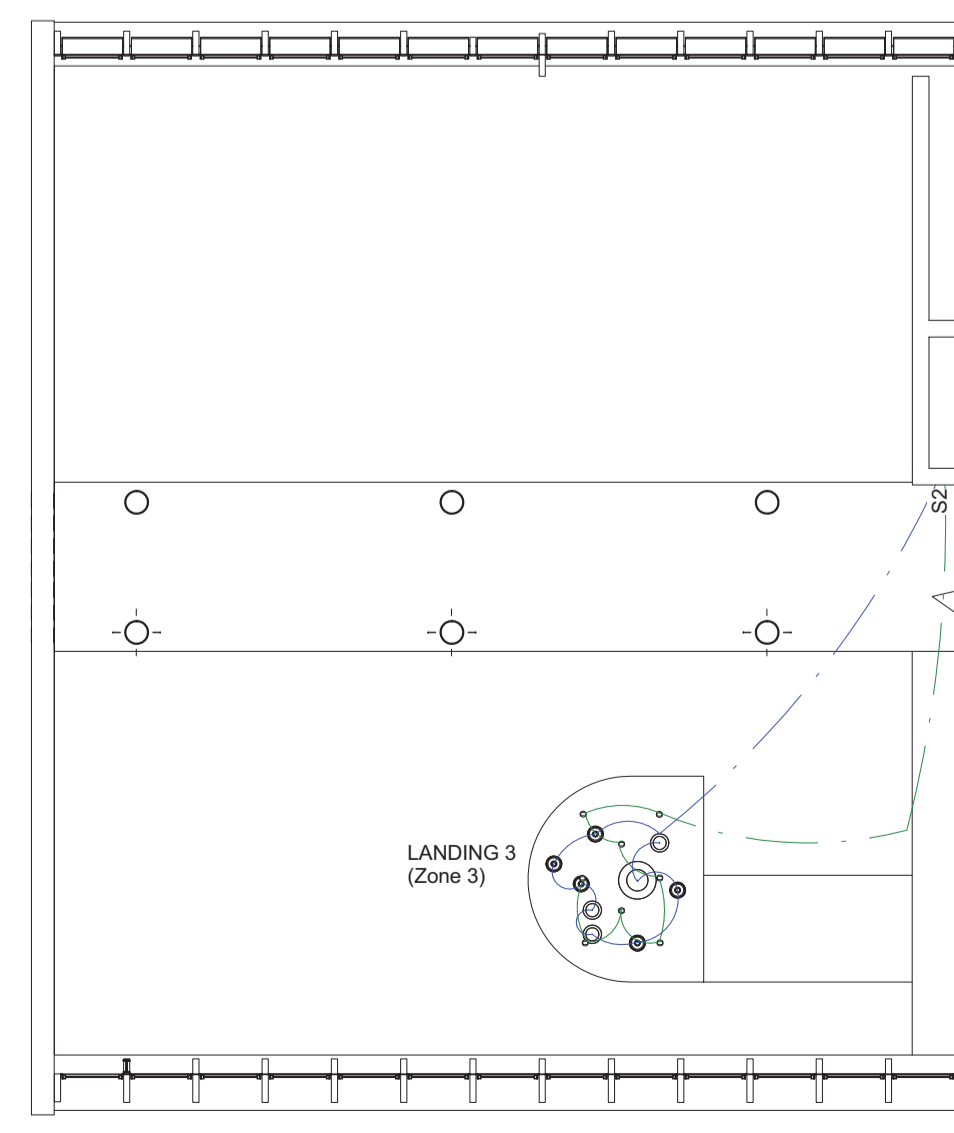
SECOND FLOOR LIGHTING PLAN
